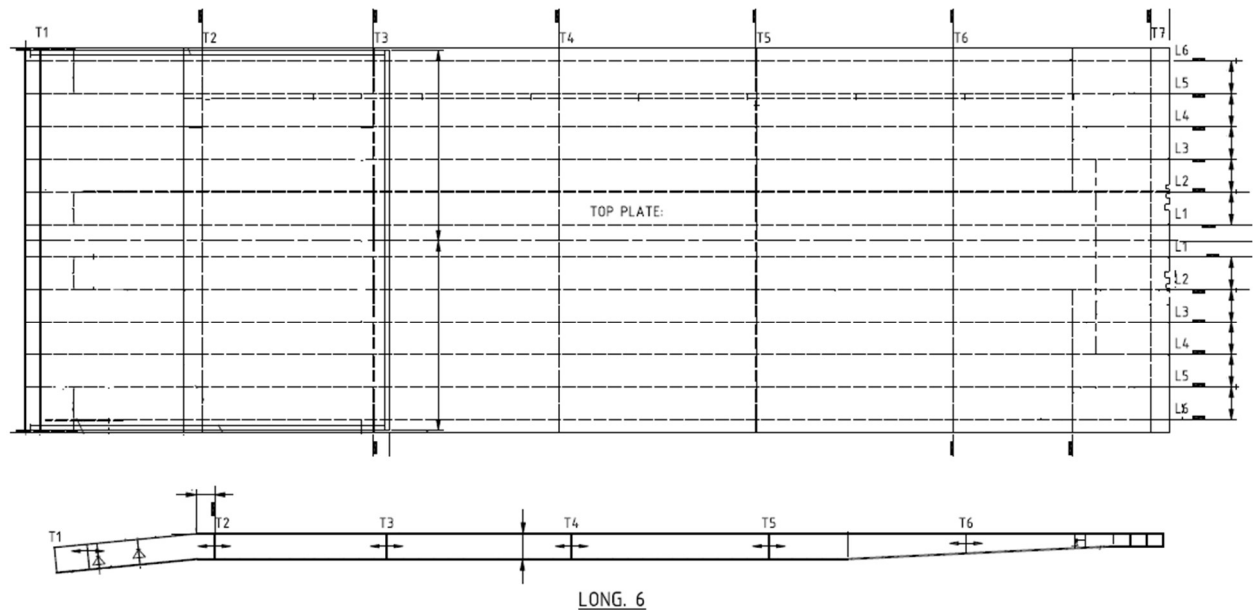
Top view of a general ramp with a Transverse, Longitudinal girder and Stiffener marked out
